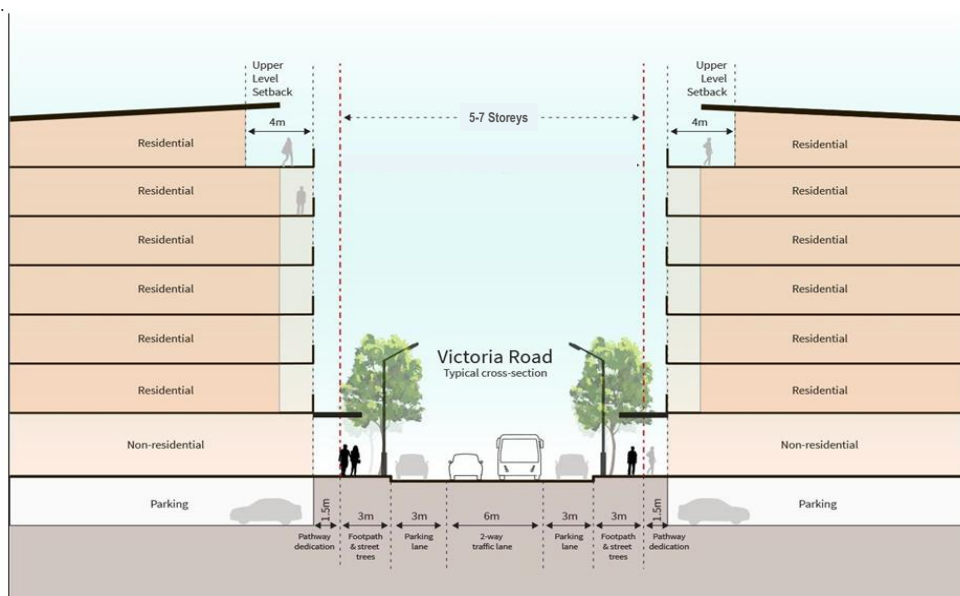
Street section 1 - Victoria Road (B4 Mixed-Use zone)
